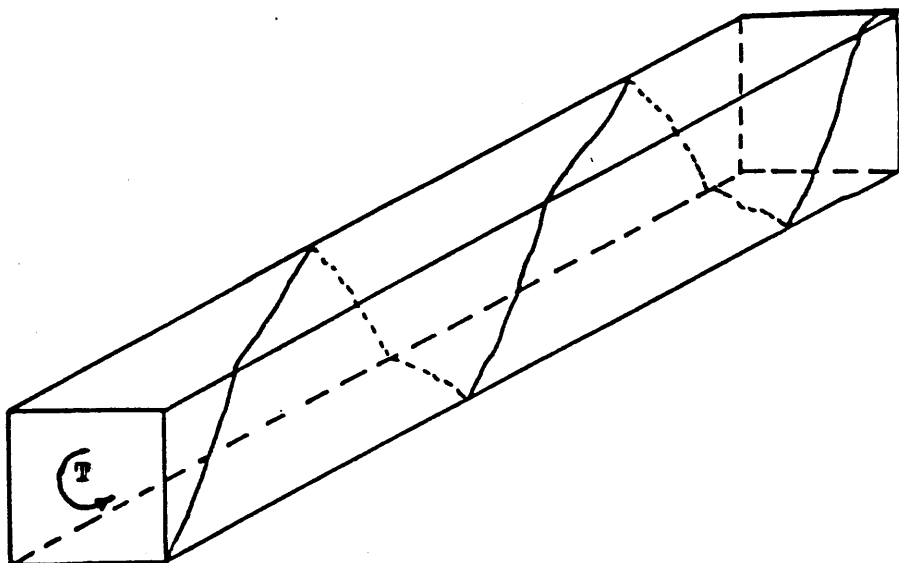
a) Helical Crack on plain Concrete Beam under pure Torsion .
